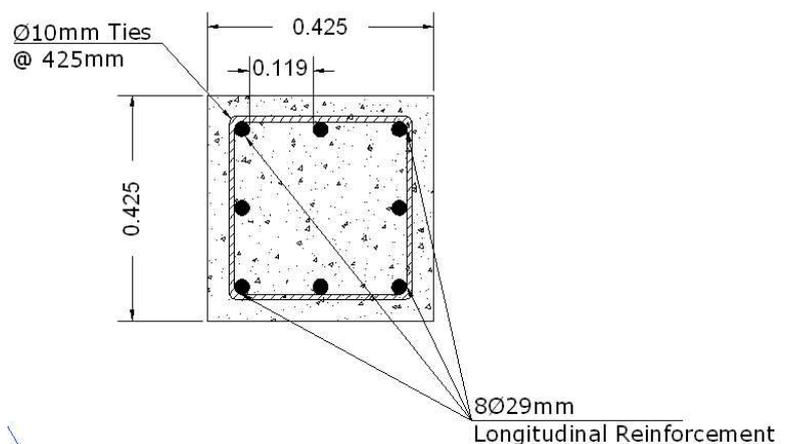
Final design section for the column of Example 9.3-1.
